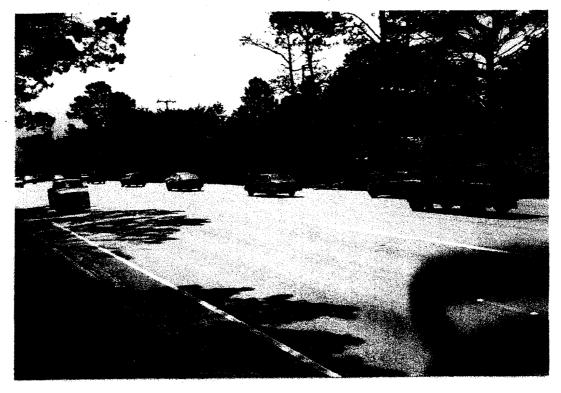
Wide angle view of existing merge lane Highway 1 south of Ocean Avenue - view looking south.
